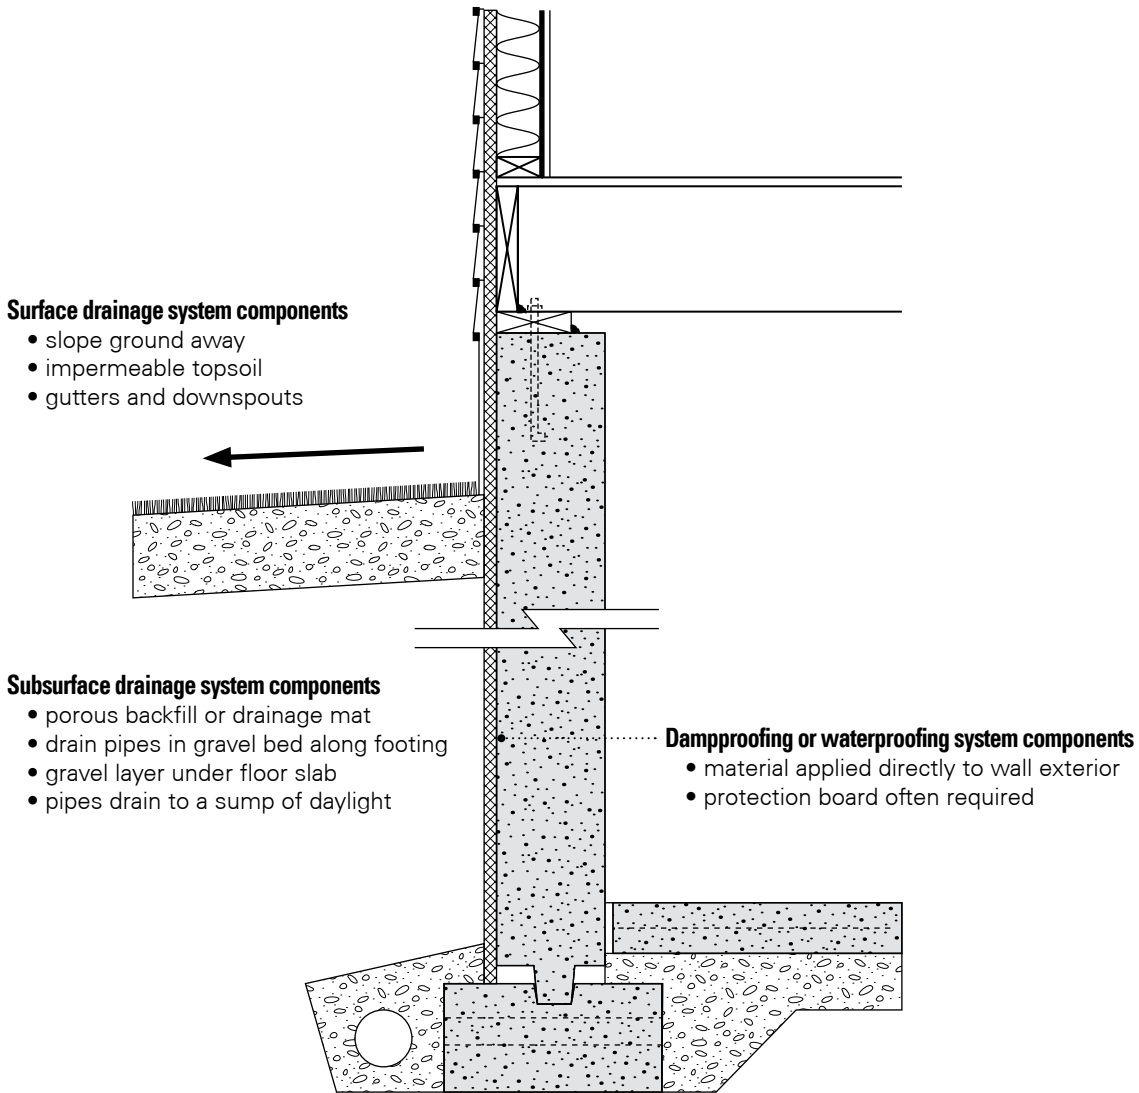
L Components of Basement Drainage and Waterproofing Systems
